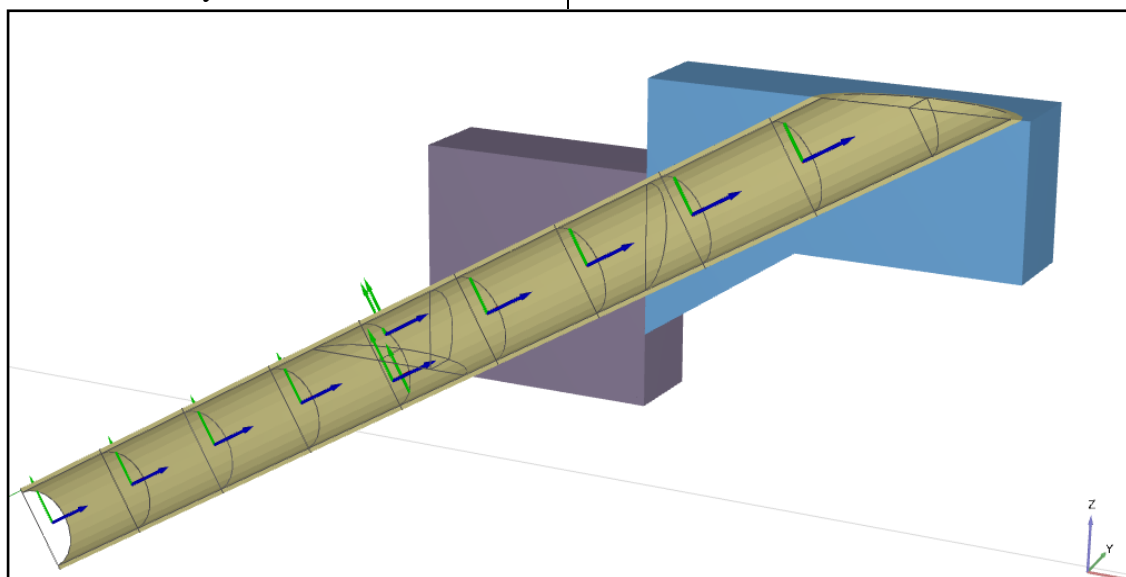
Spasskaya underground station escalator tunnel model with consolidation of middle mass section.
